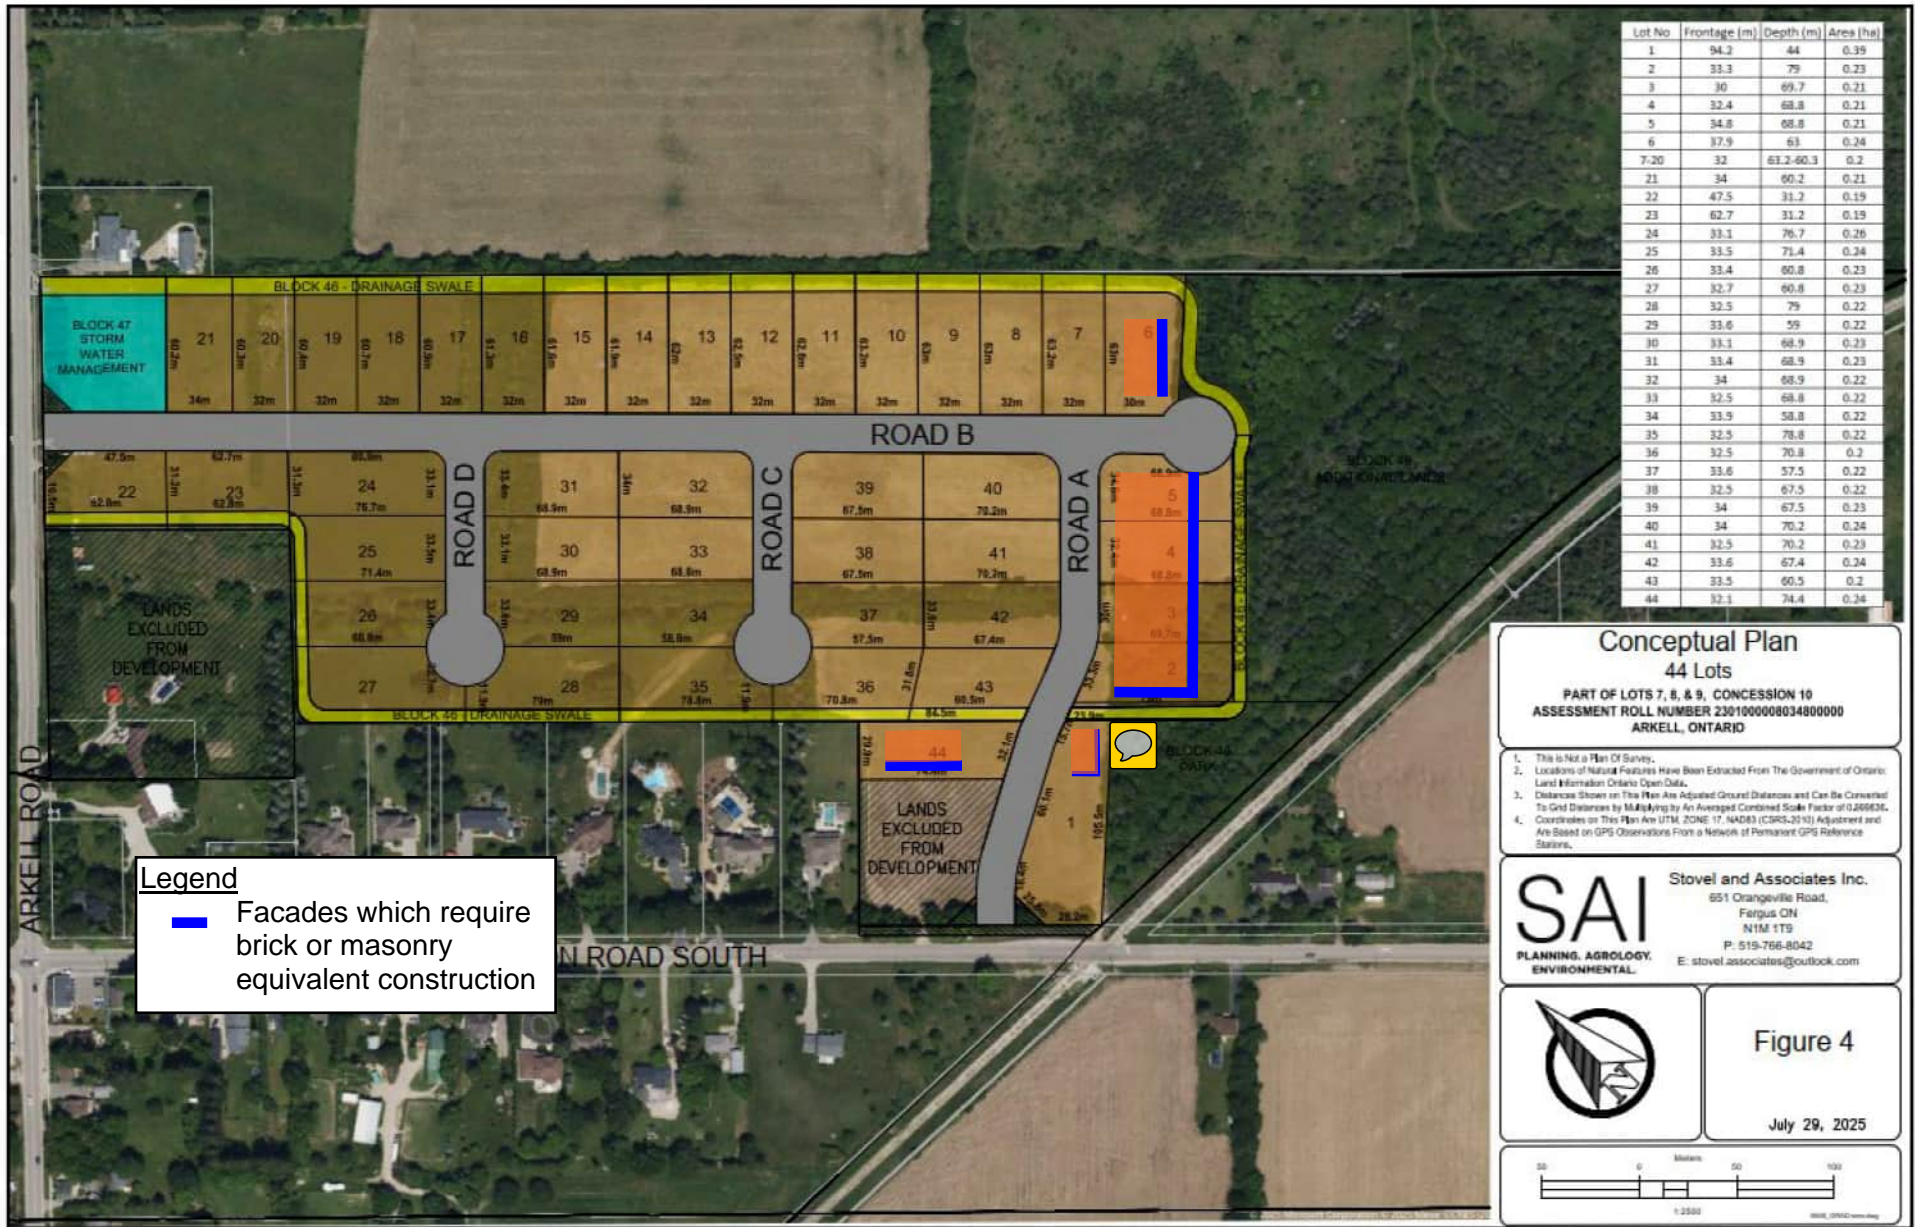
Proposed Concept Plan Showing Ventilation and Acoustic Barrier Requirements
